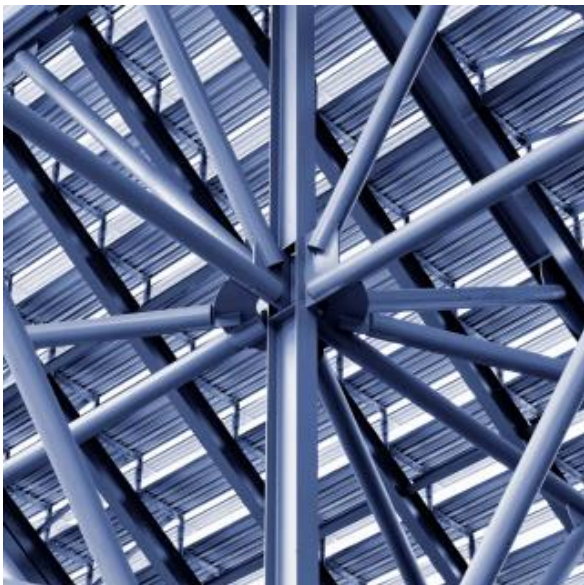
WELDED CHS SLOTTED GUSSET PLATE JOINTS [GOOGLE]
